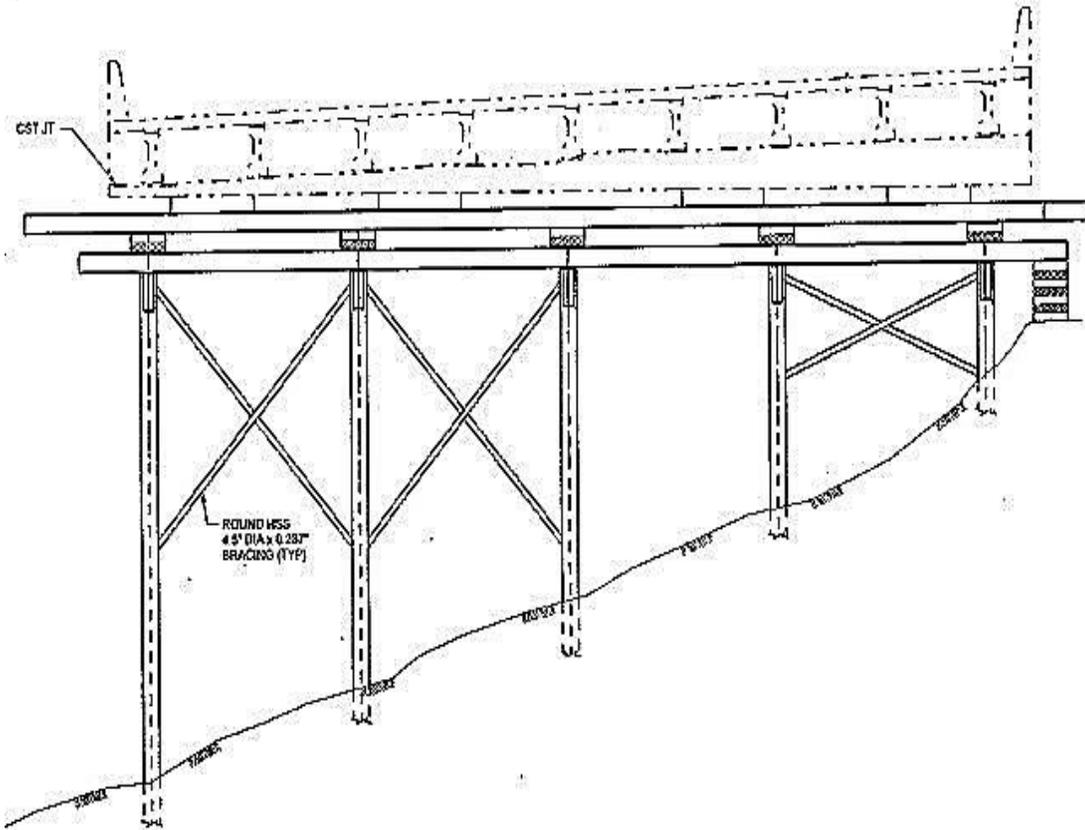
Side view of the I-80 over 2300 East temporary substructure for the WB and EB bridges
